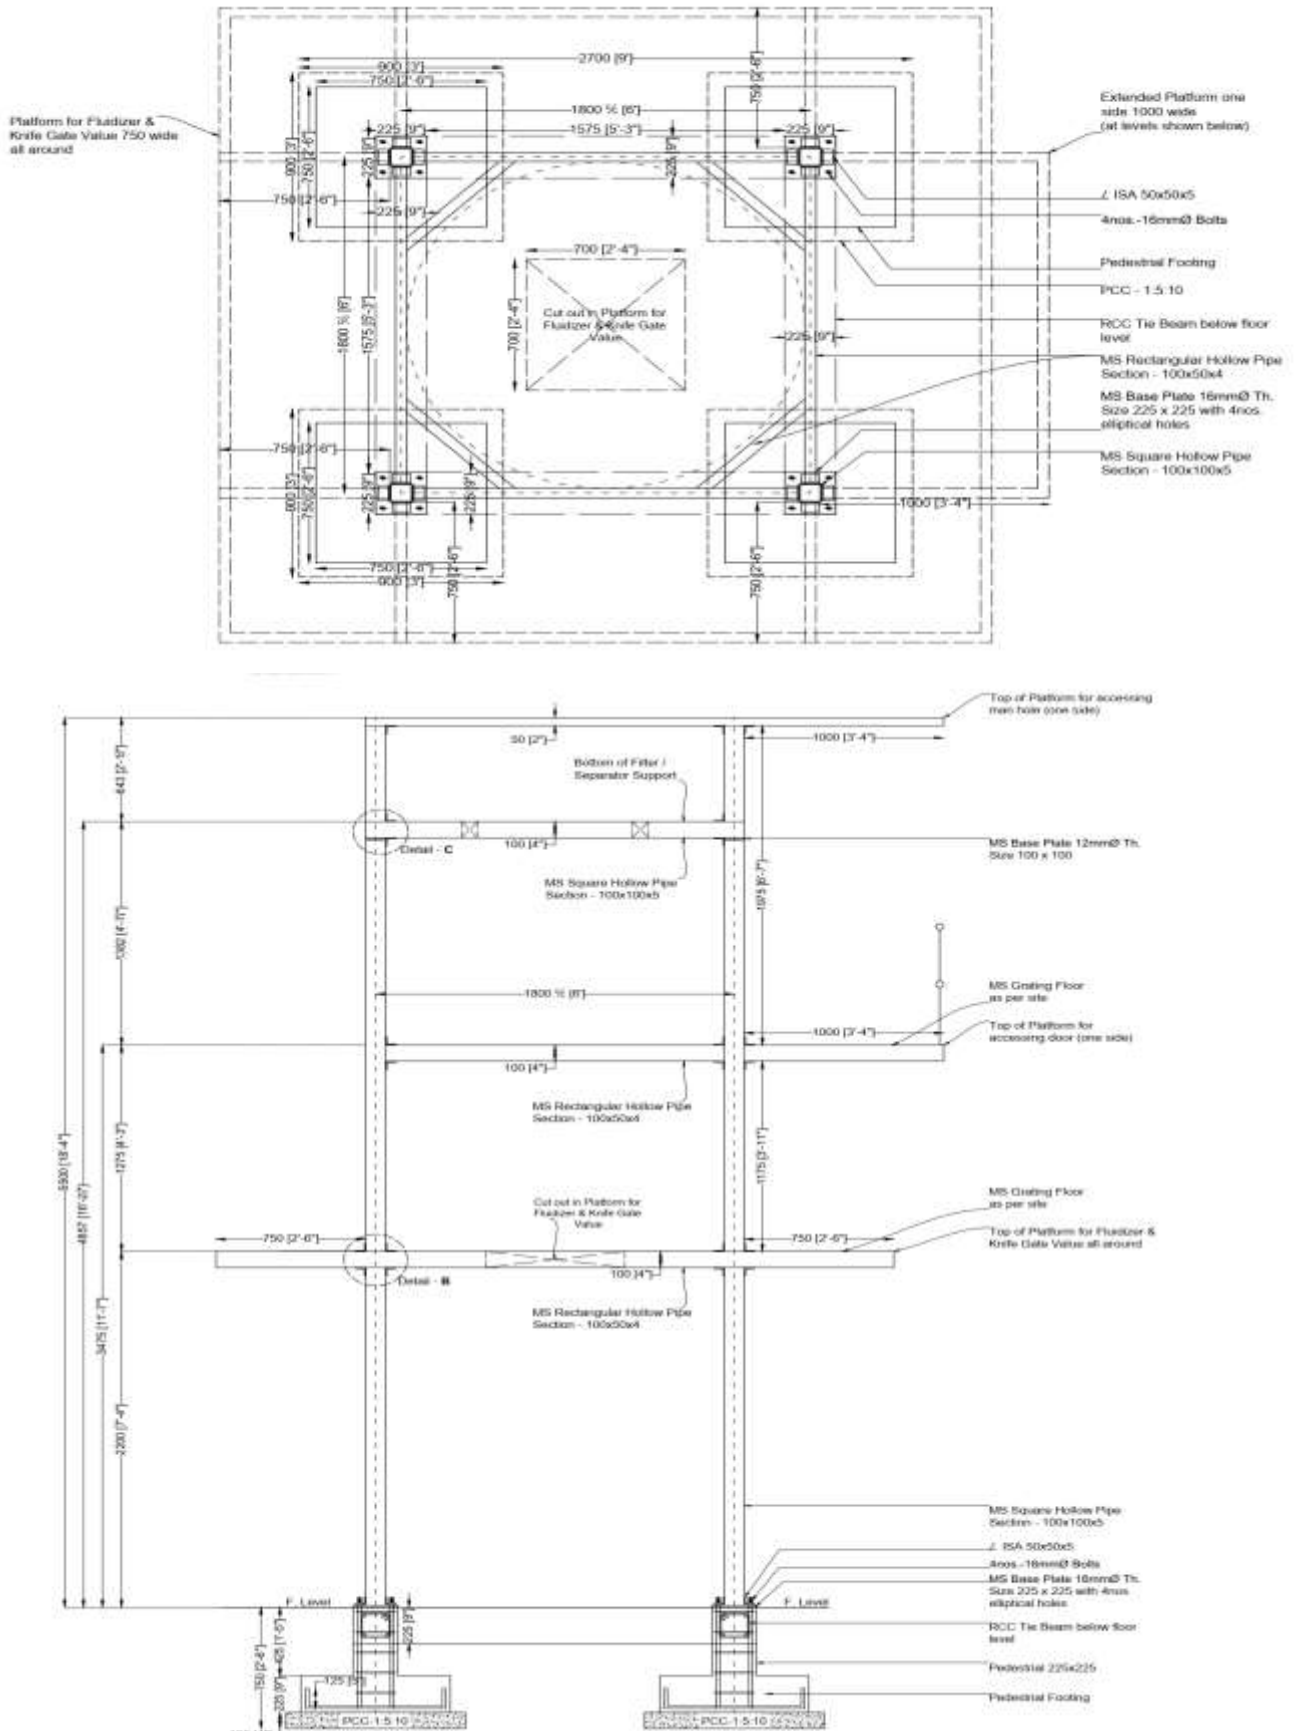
Plan and elevation of supporting structure for vacuum test rig stacked-up assembly
